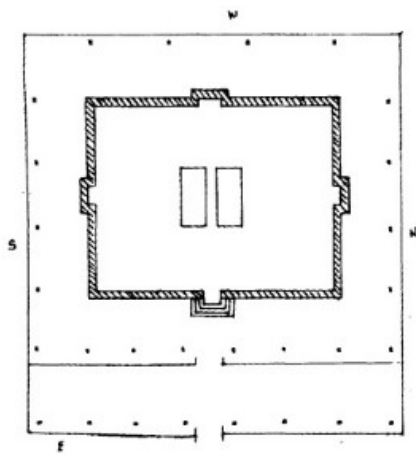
Mausoleum of Alaudin Madurai - Plan
